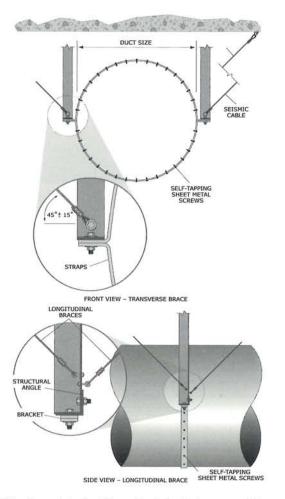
Round duct with vertical steel shapes and braced with cables (transverse and longitudinal).
